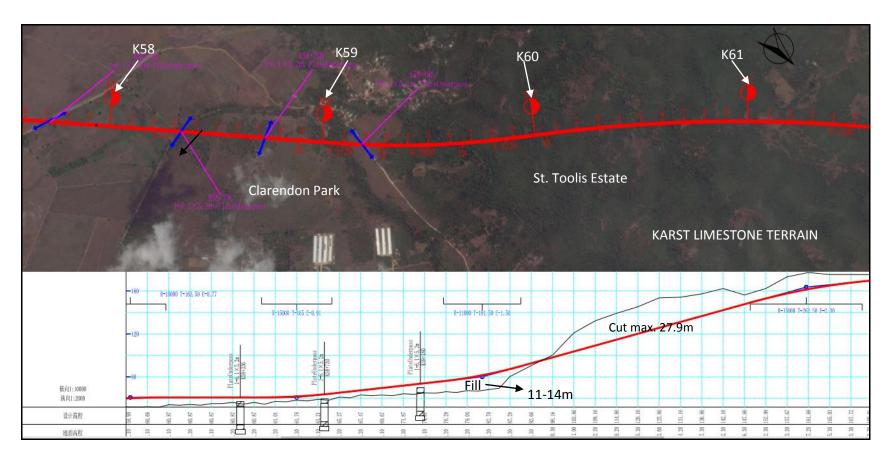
Proposed Road Gradient Profile for Highway Alignment as it enters the hilly Limestone Terrain of St. Toolis Deep Cuts and extensive Fill (earth works) are to be conducted for Construction of the May Pen to Williamsfield Highway.
